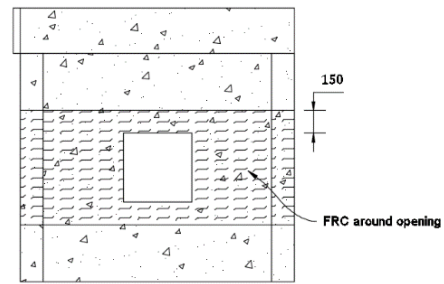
Fibre Reinforced Concrete (FRC) around opening
